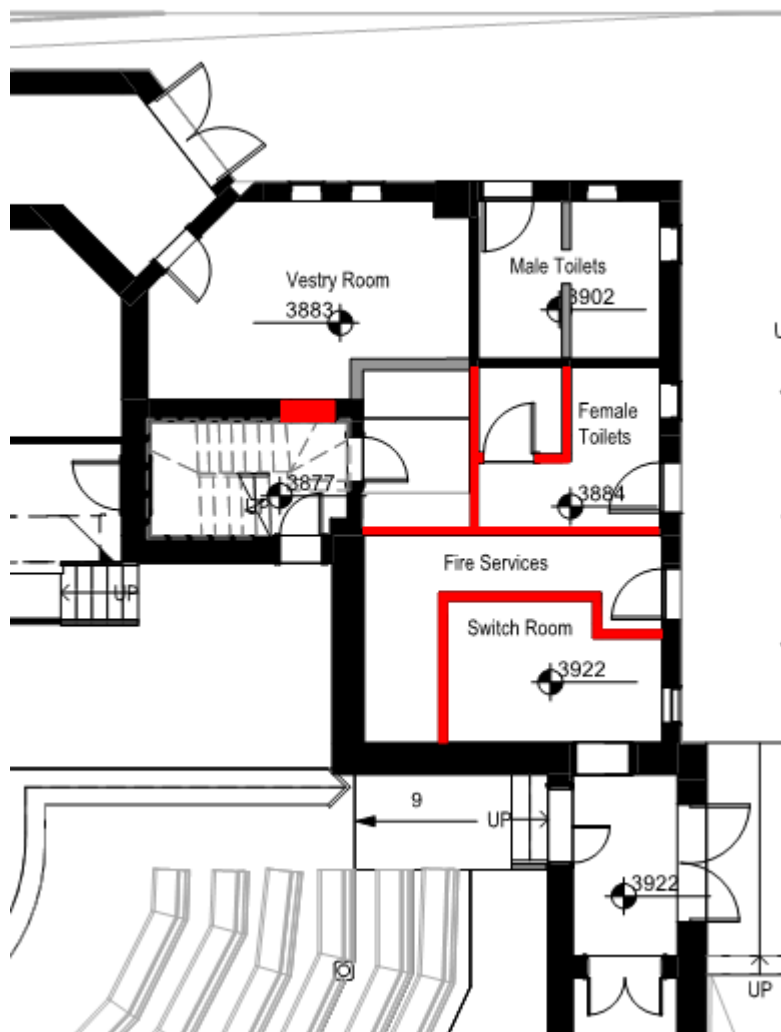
Part plan of level 01 indicating proposed walls to be removed.
